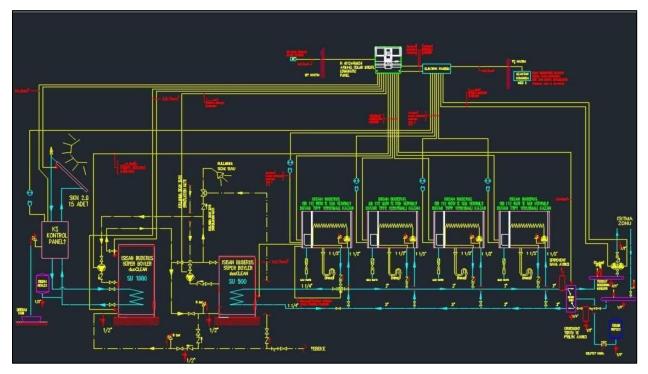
BAutocad Drawing Of Roof Top Solar
